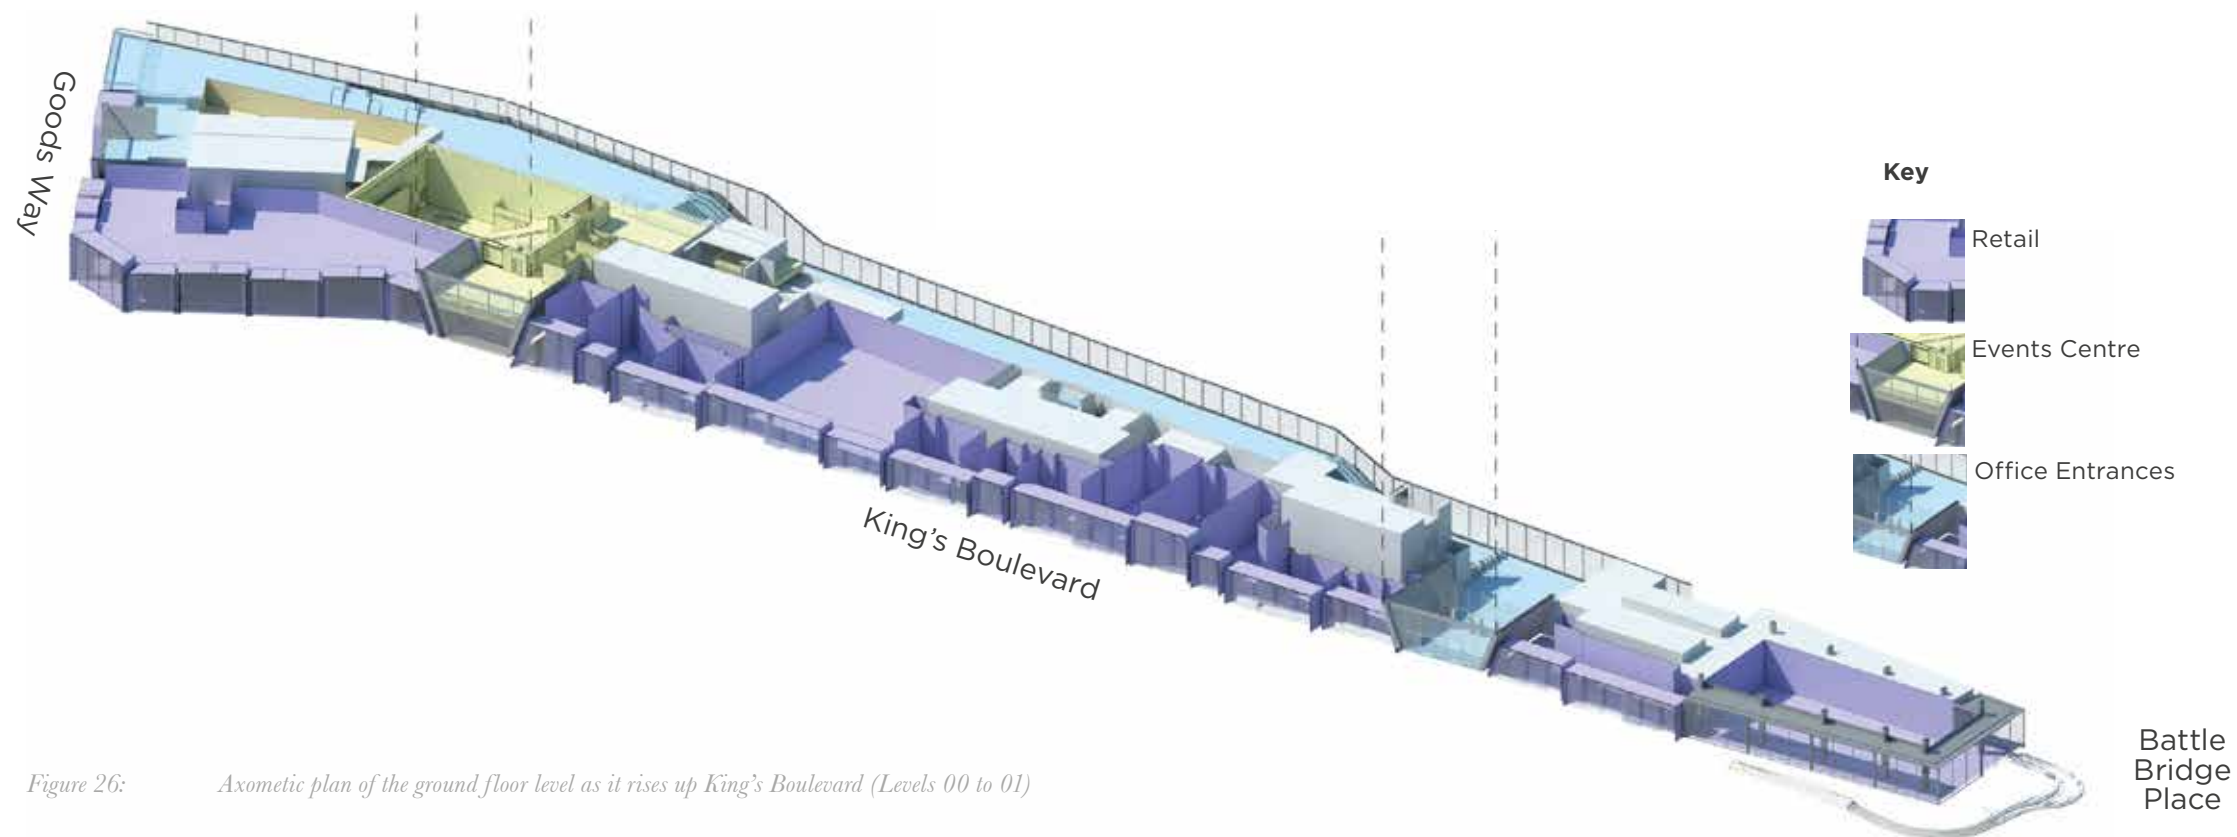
Axometric plan of the ground floor level as it rises up King's Boulevard (Levels 00 to 01)
